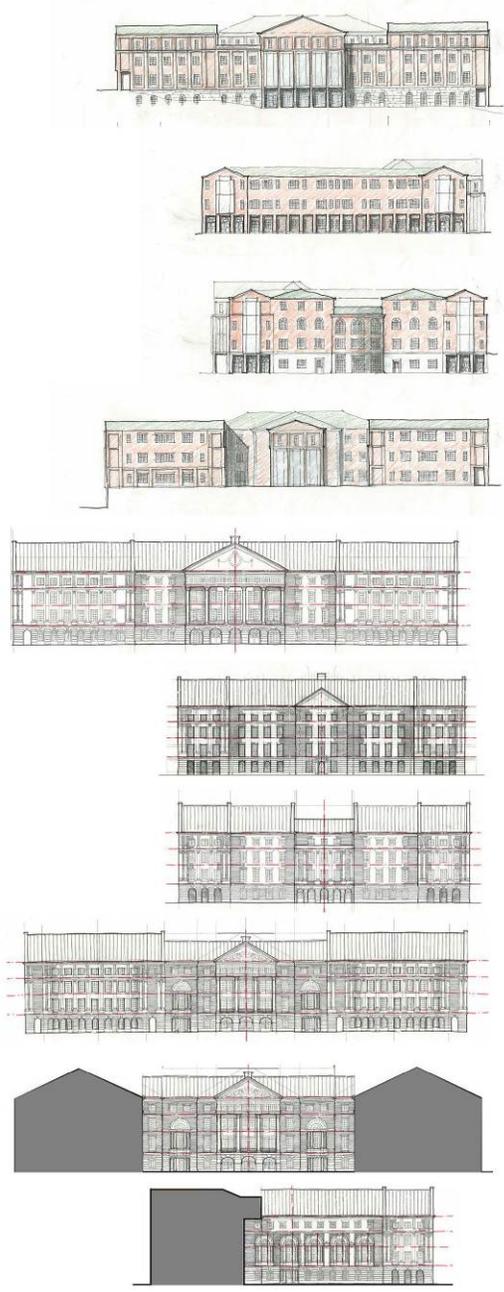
WFU Architecture School – Process Plans Study (source: Author)
